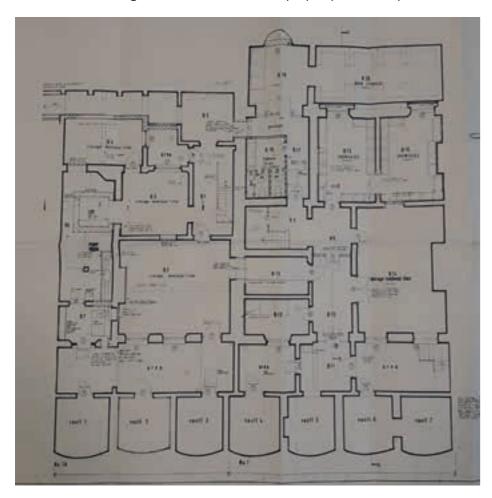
Basement plan of the properties in 1984 showing access corridor to the British Museum and assorted storage uses
